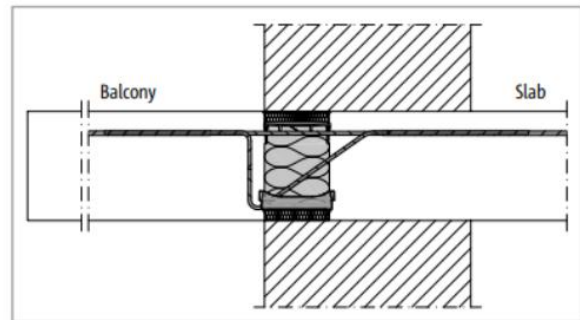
Schöck Isokorb® XT type K: Connection with single-leaf masonry
